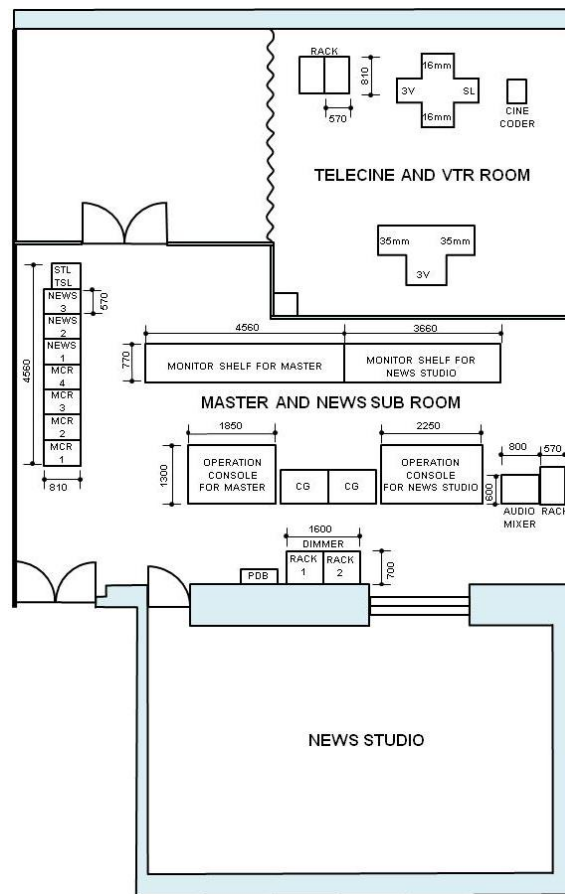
Master Control and News Sub-control Room/News Studio/Telecine Room Equipment Arrangement
